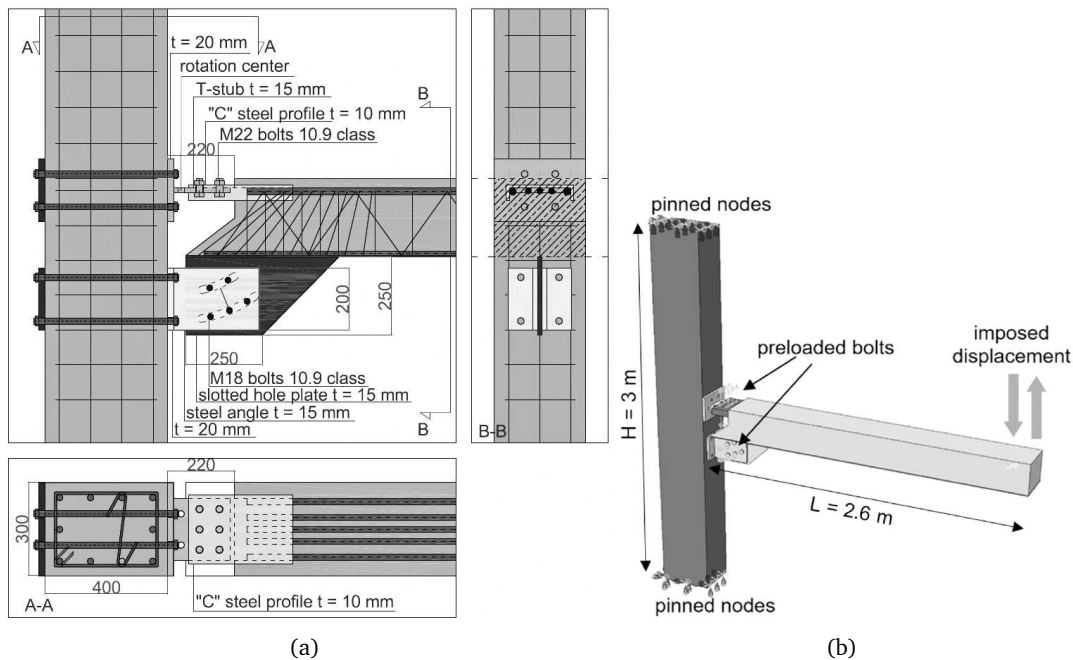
Dissipative connections for hybrid steel trussed concrete beams presented by Colajanni et al. (2021): (a) frame installation and (b) numerical study.
